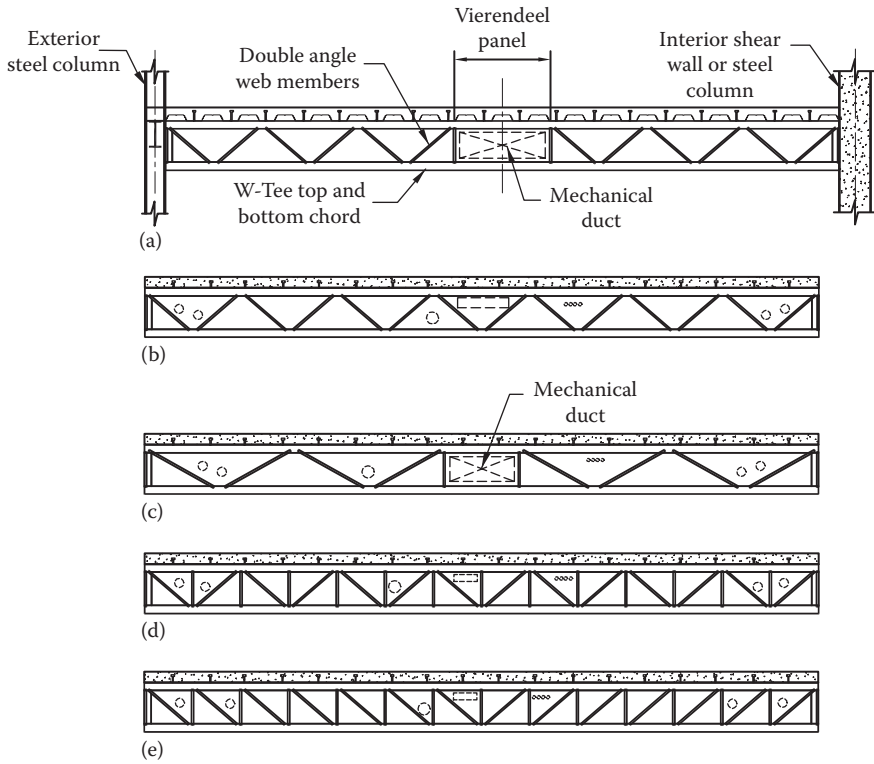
Examples of composite floor trusses: (a–e) elevations.
